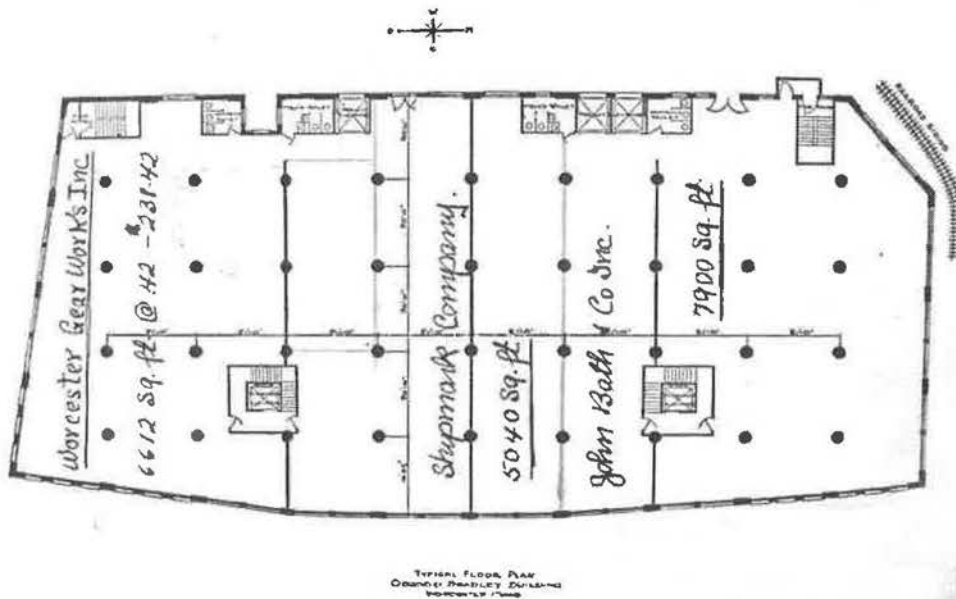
"Typical floor plan" of the Osgood Bradley Building (ca. 1918; image found in the archives of the Osgood Bradley Building, courtesy of Brad Wyatt)
